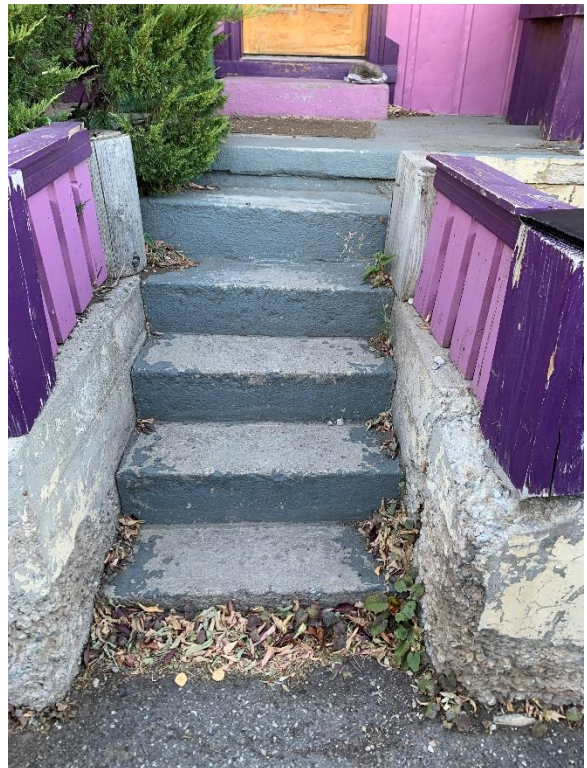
East elevationPhoto 67: East elevationPhoto 66: East elevationPhoto 68: Entry stairs
